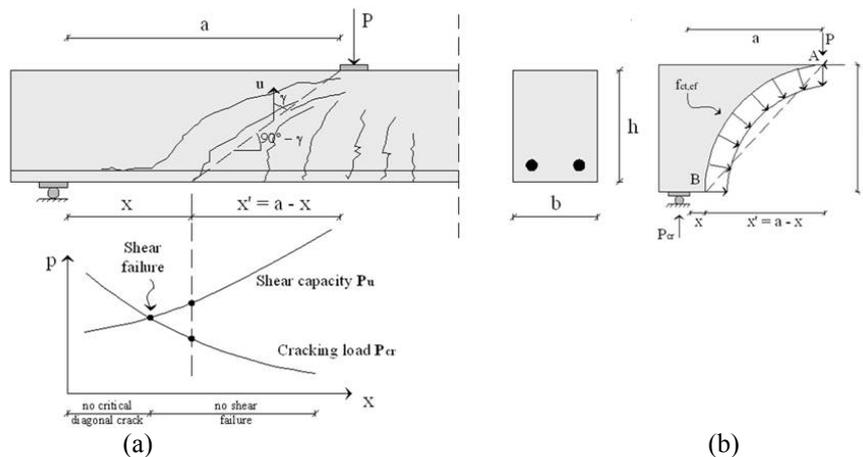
Crack pattern in a beam without stirrups at (a) shear failure and (b) first cracking (Spinella *et al.* 2010)
